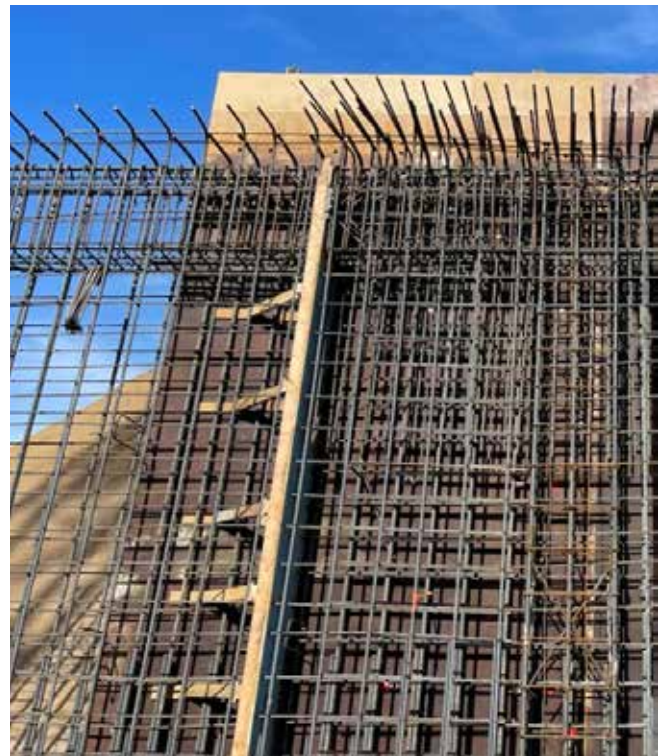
Formwork for a construction joint in a foundation wall with two layers of reinforcement. This joint type is labor- and time-intensive because the horizontal bars must be continuous through the joint, and the form must be braced against high concrete pressures. (Image courtesy of Hensel Phelps.)
